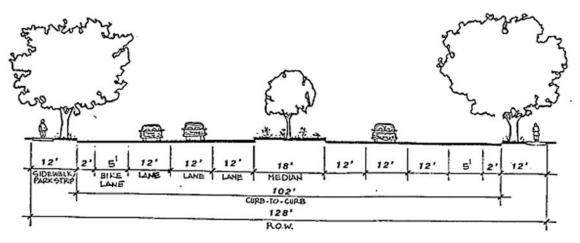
DIVIDED/MINOR ARTERIAL CROSS-SECTIONS
